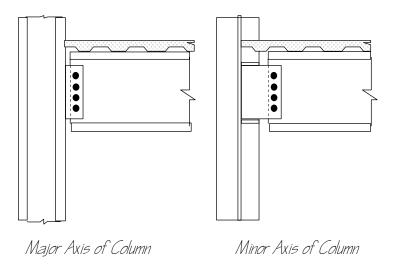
Typical Simple Shear Tab Connection with Slab
